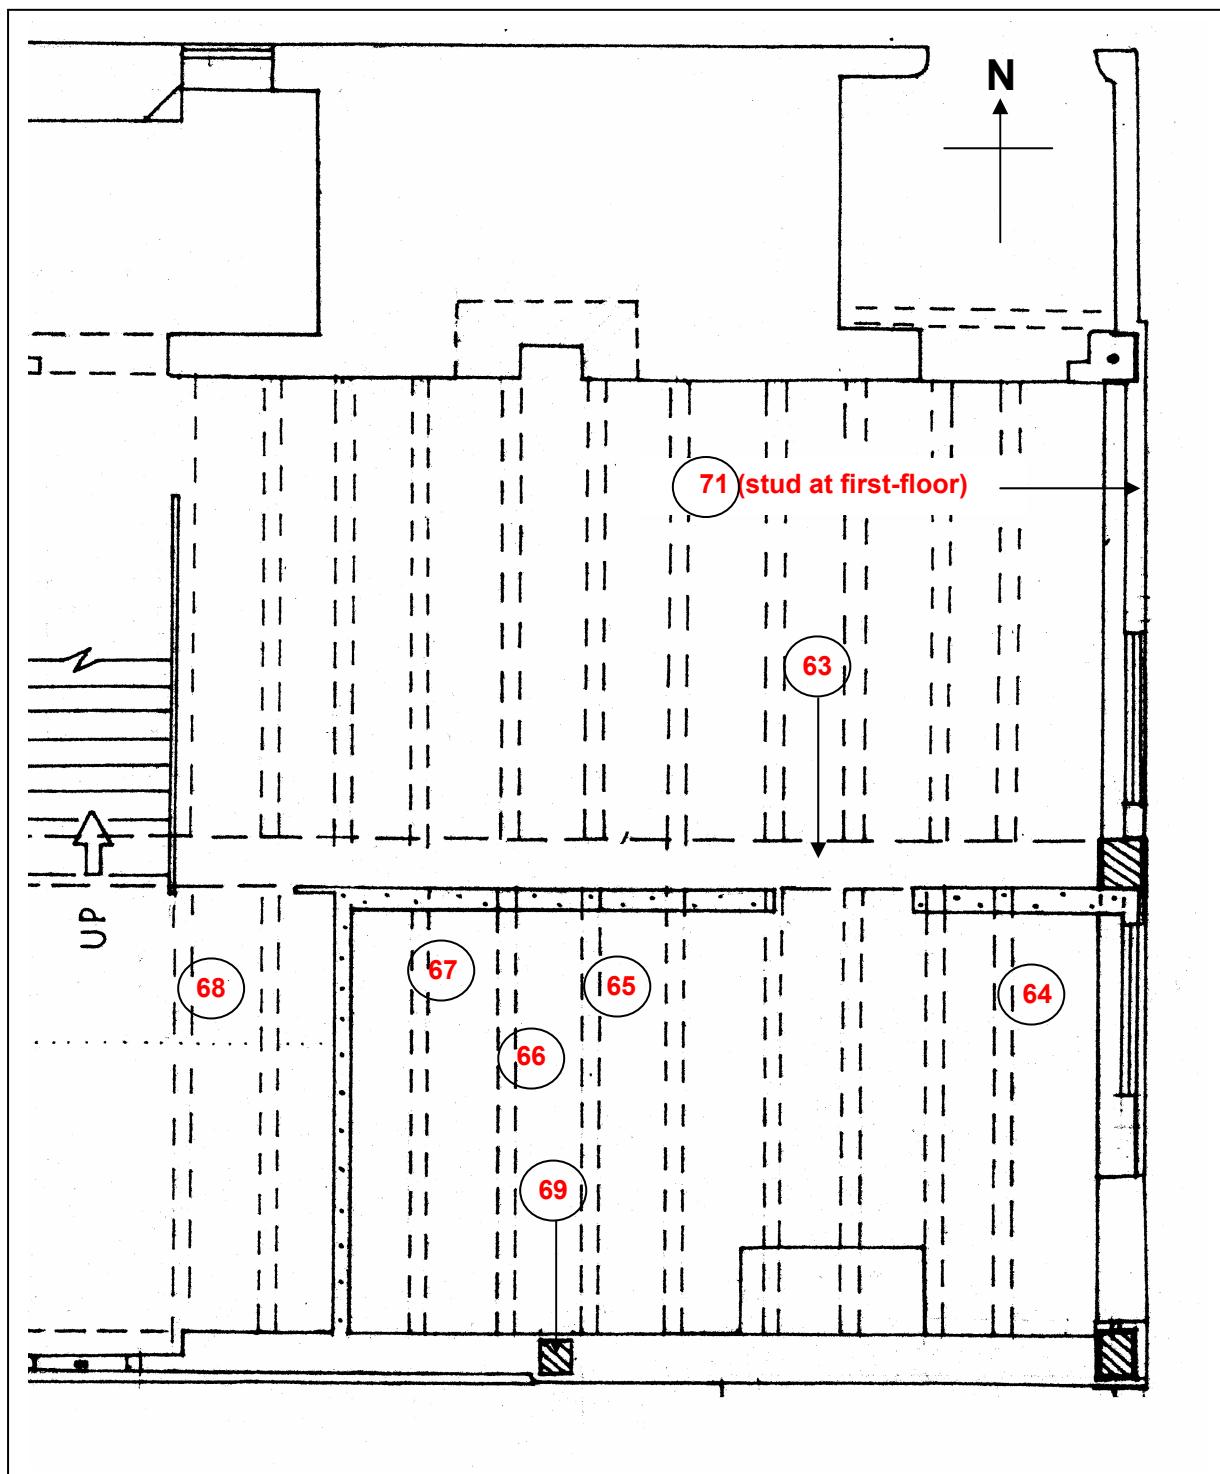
The 'North-east building' to show later roof timbers sampled
